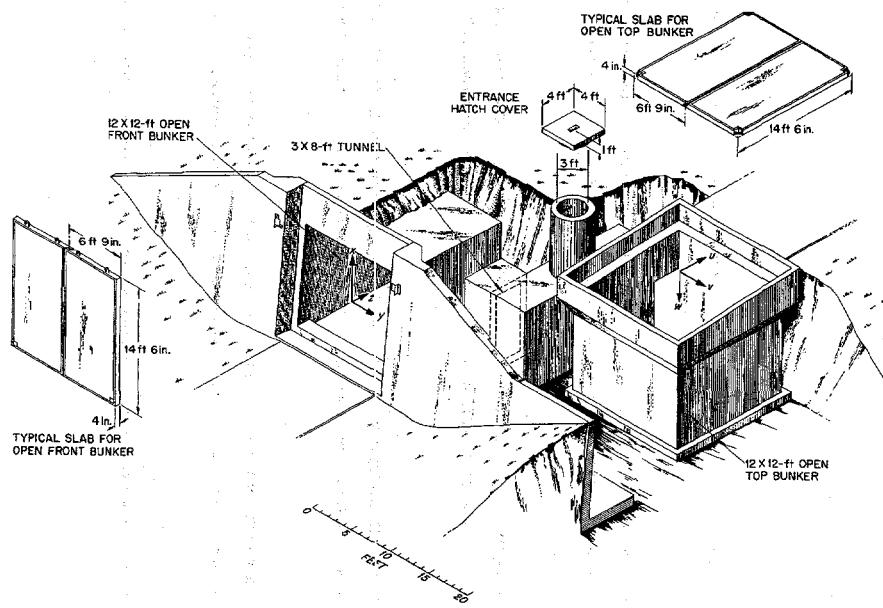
Schematic of Concrete Bunkers and Interconnecting Tunnel.
